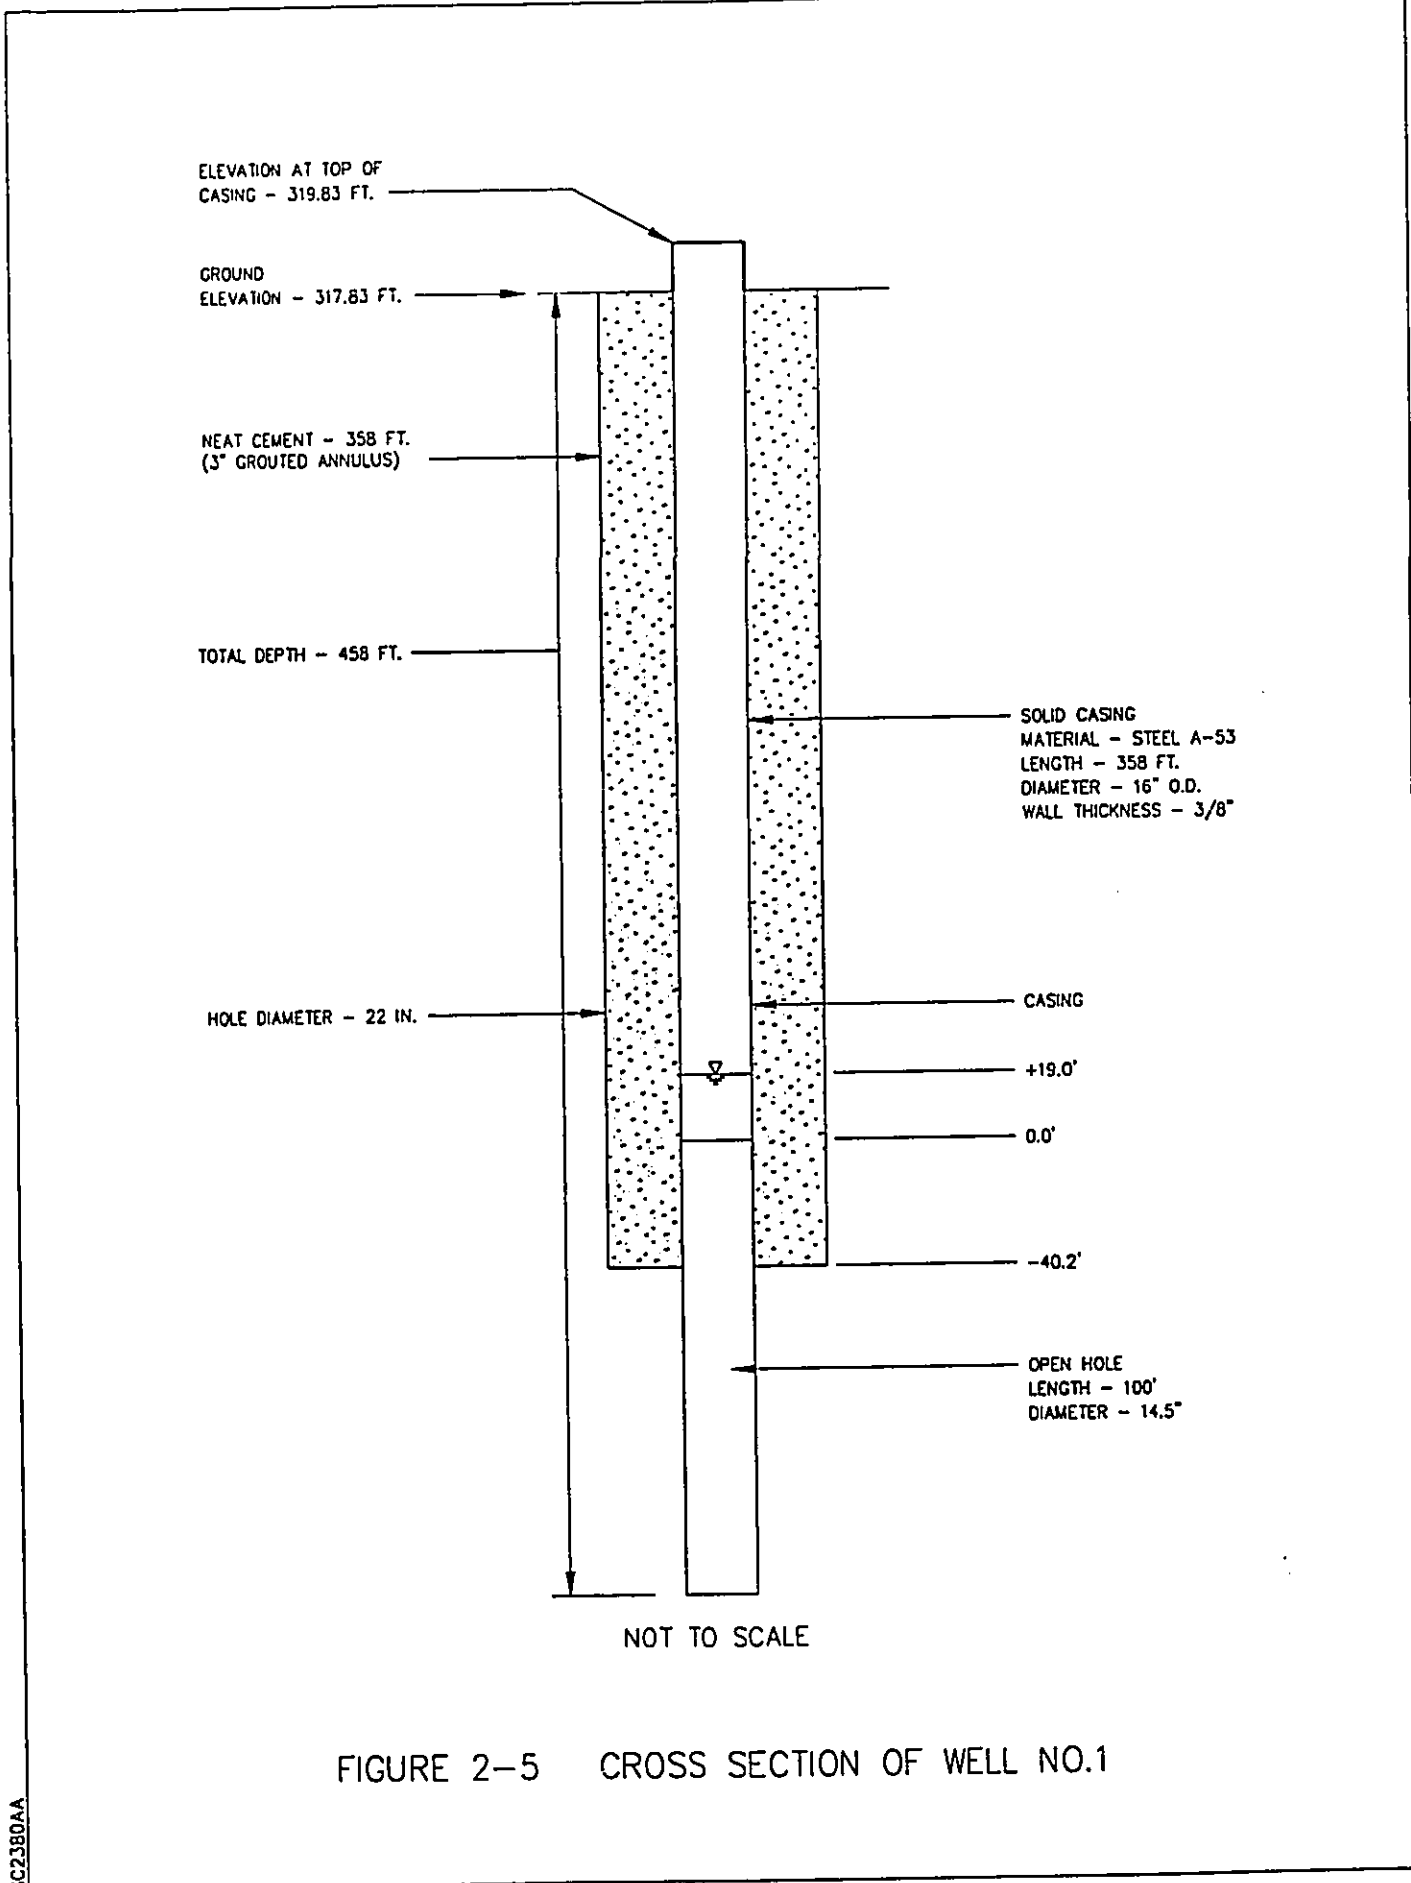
CROSS SECTION OF WELL NO.1
